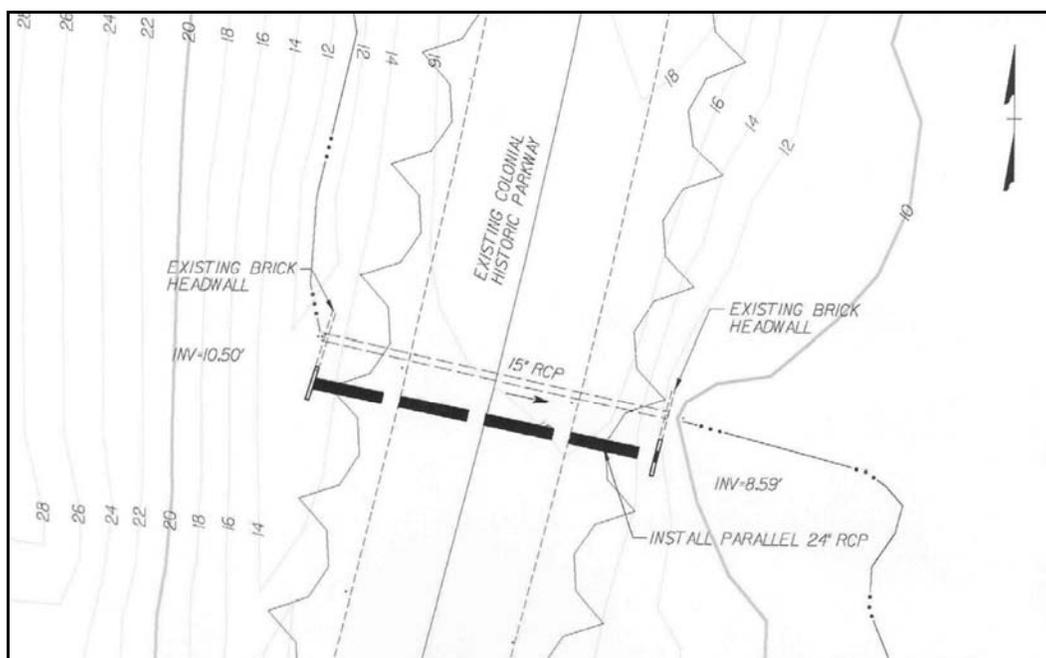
Concept Plan of Alternative 3 at Site C (Install Parallel 24-inch RCP); Source: NPS, 2005
